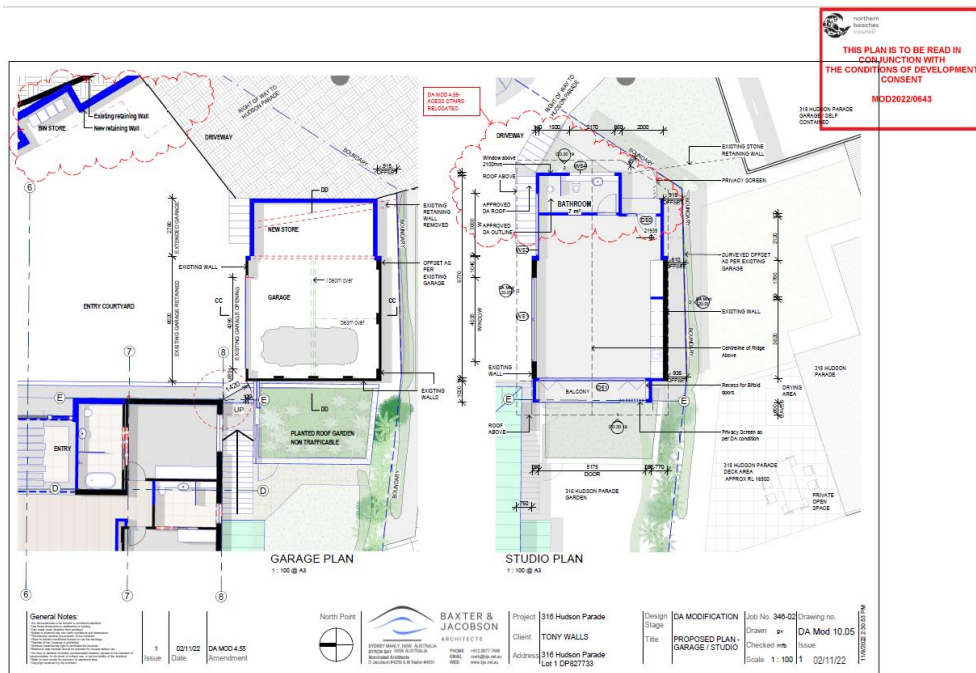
Plan Extract: Modified Garage / Studio Plan.
